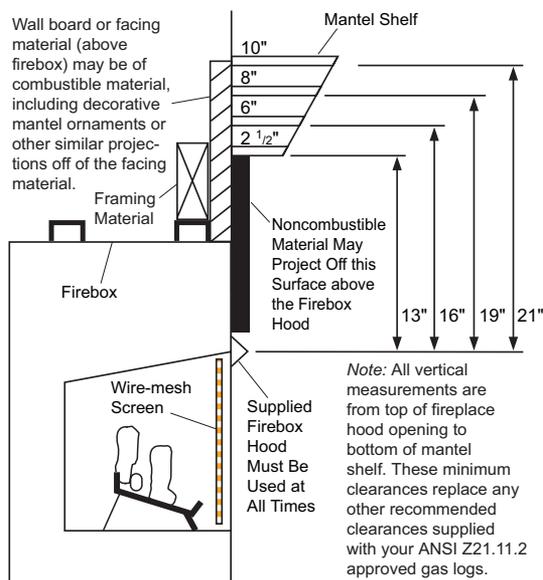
Minimum Mantel Clearances for Built-In Installation
